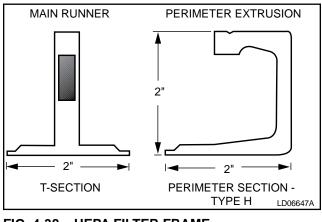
HEPA FILTER FRAME CROSS SECTION VIEW
